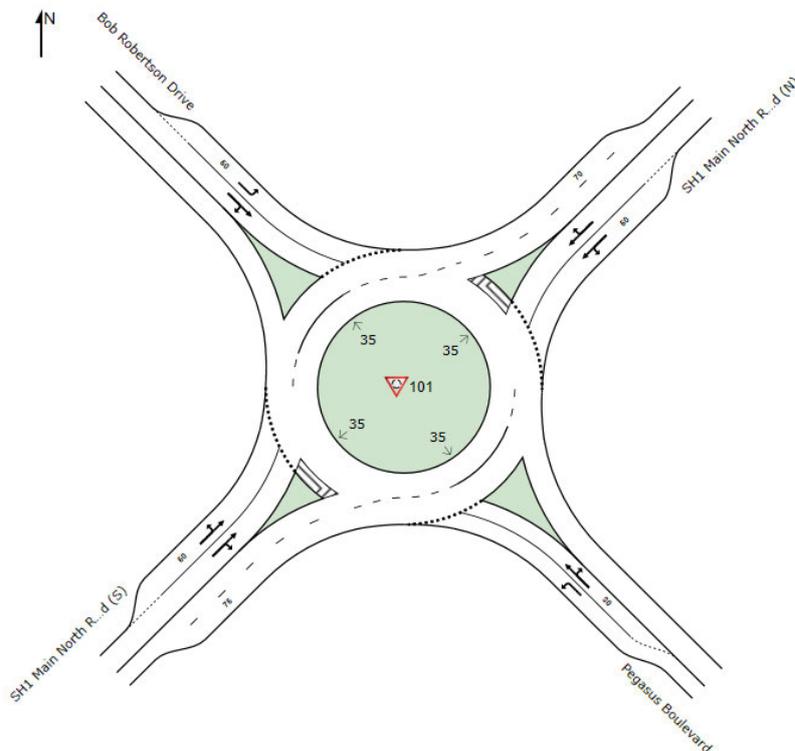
Previously Proposed Pegasus Roundabout Layout (Designation Scheme Design)
